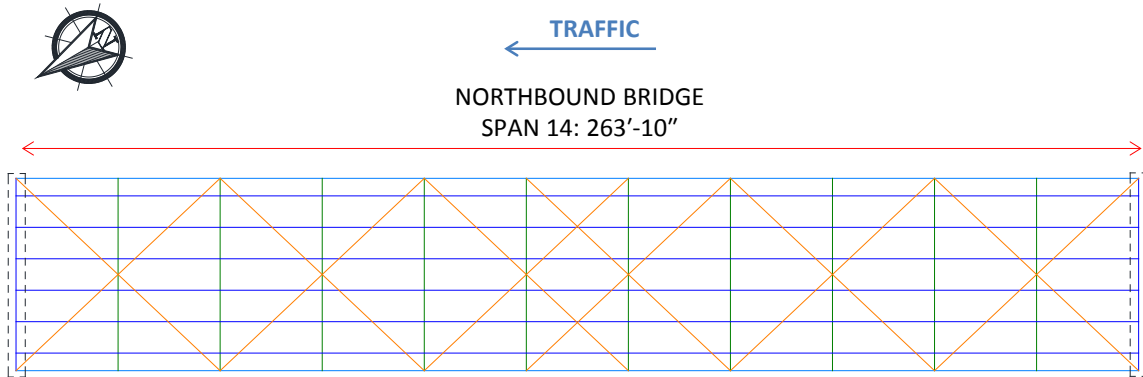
Dimensioned plan view of the fourteenth span of the northbound I-5 Bridge showing the lateral bracing system.
